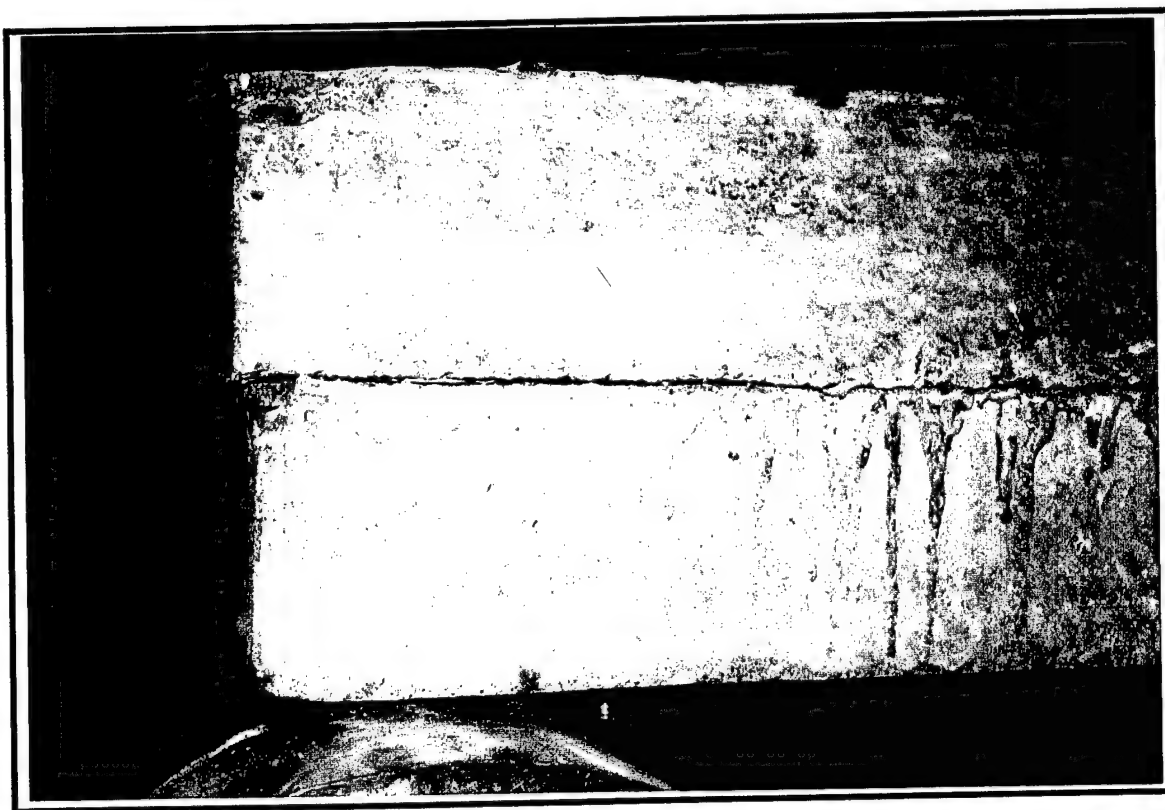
Beam With Fibers #2 – Horizontal Shear Failure
